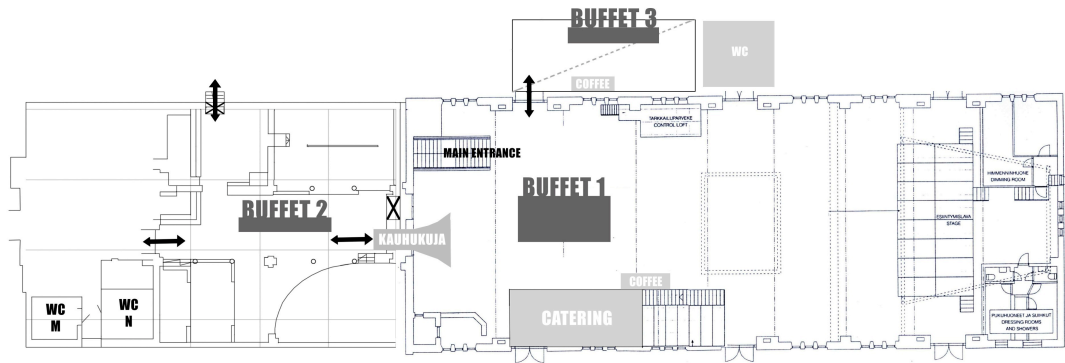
Buffet, coffee table and catering area set-up on event floor plan
